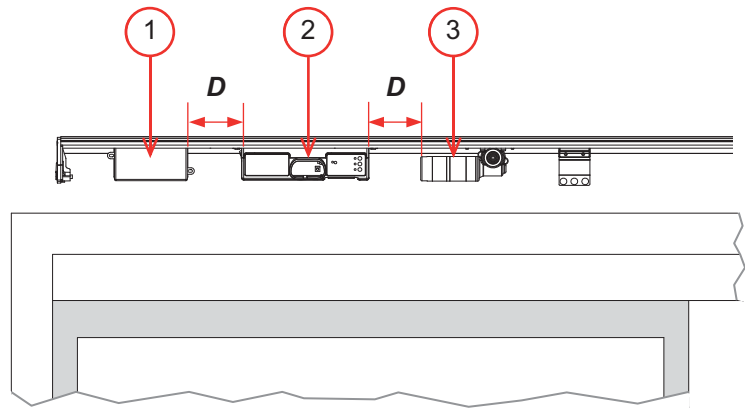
Bi-parting doors: AC adapter (1), controller (2), and motor (3).
